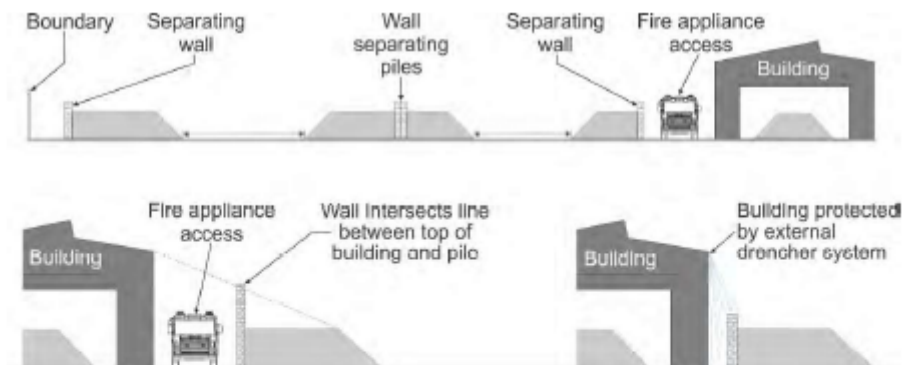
Examples of reduced separation using masonry wall or sprinkler system
